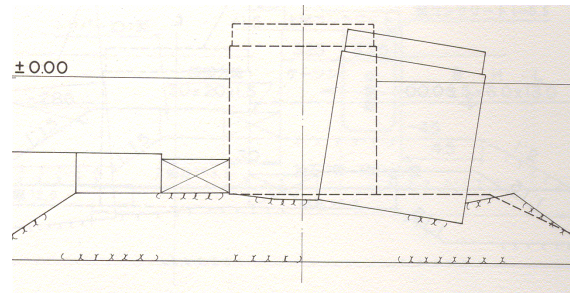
Complex failure of caisson (sliding and tilting failures)
